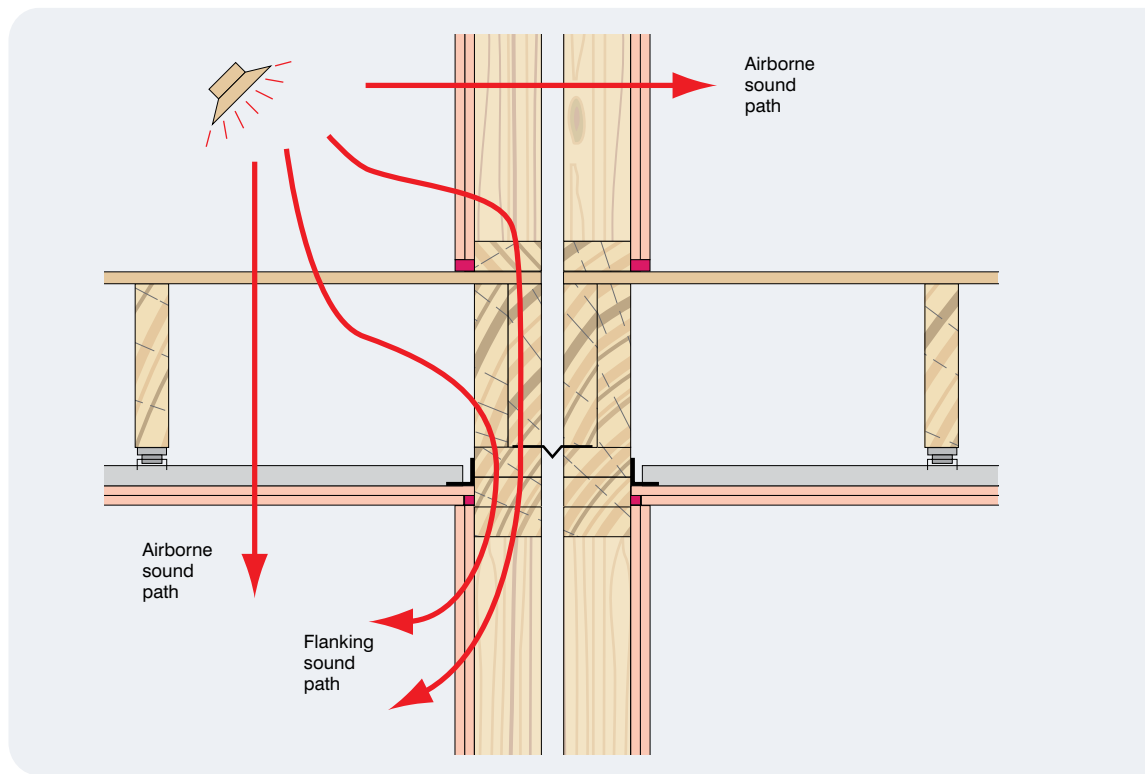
Flanking and airborne noise pathways – elevation view.
